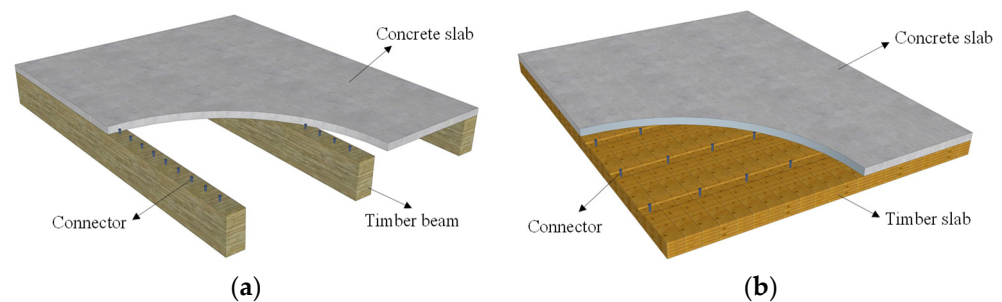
Diagrams of the TCC floor: (a) with timber beams and (b) with a timber slab.
